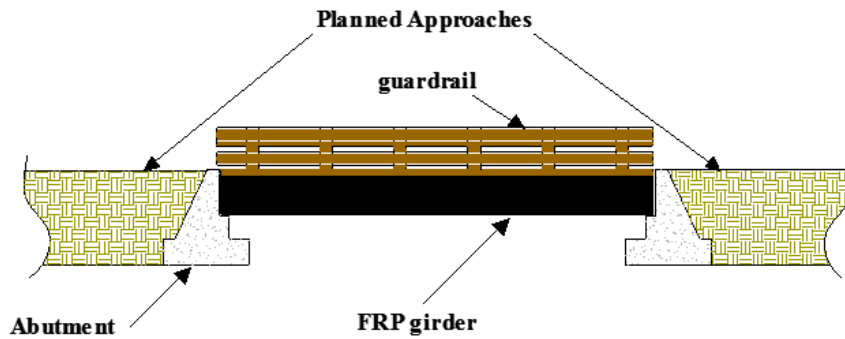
Elevation View of the Route 601 Bridge with Planned Approach Slabs (Restrepo, 2002)
